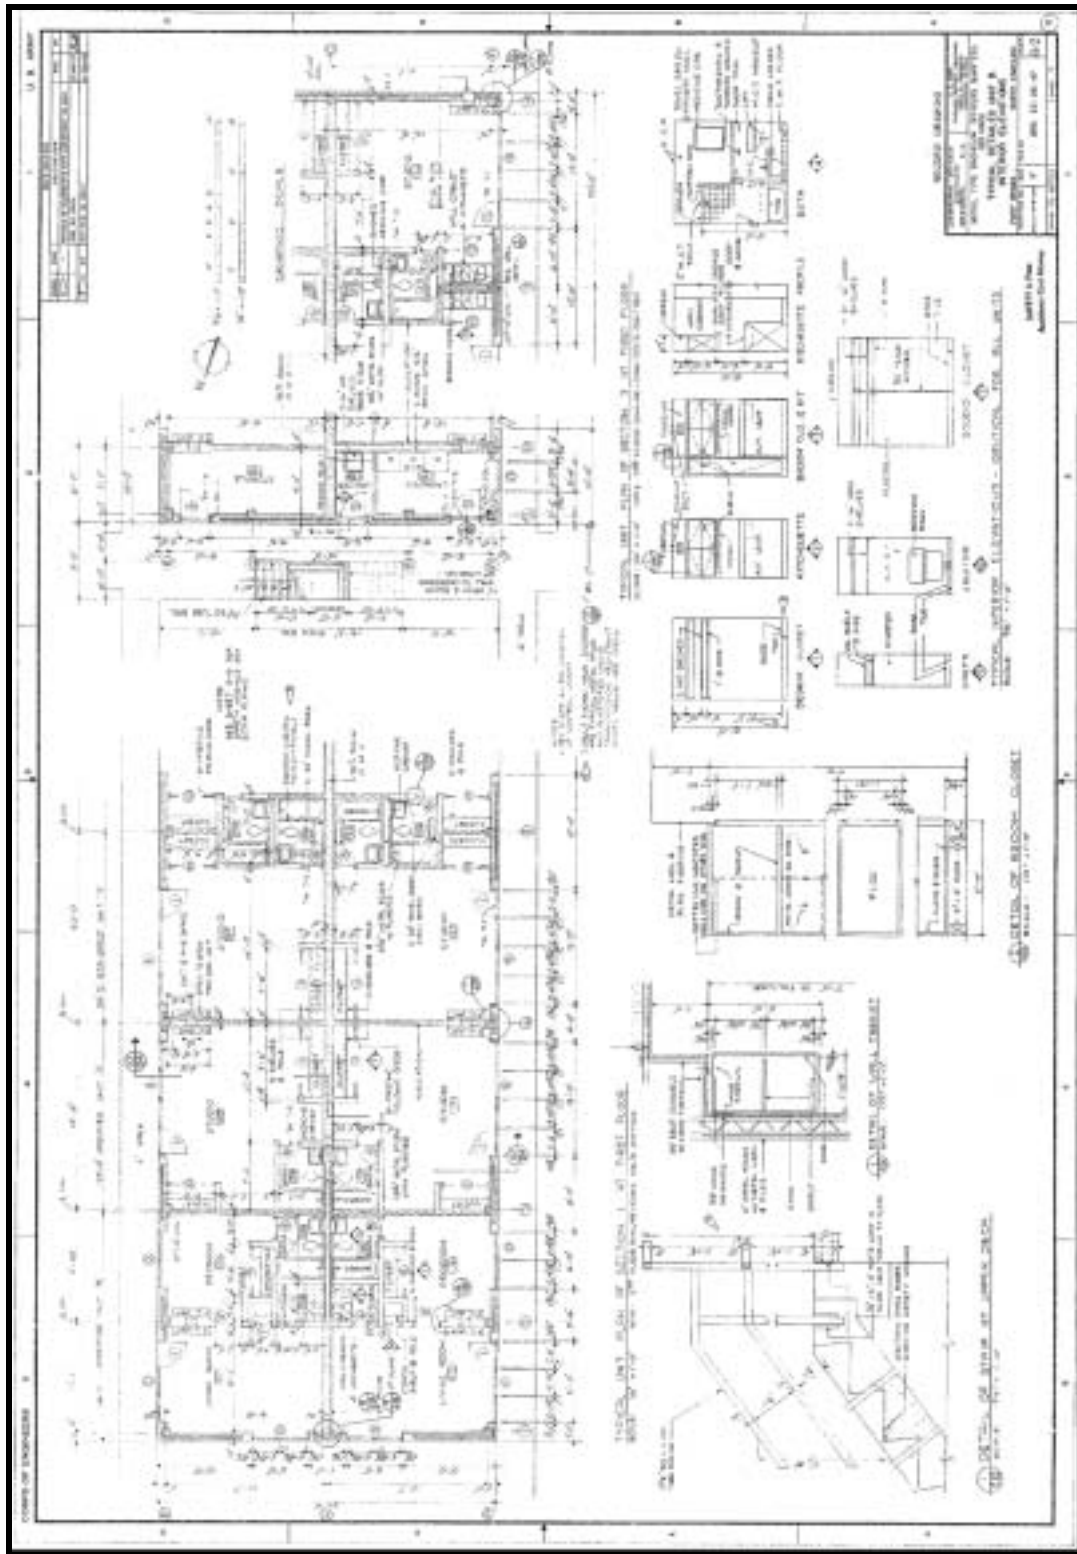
120-man motel type BOQ, typical unit and interior elevations, Ft. Bragg (1967, revised 1969) (Engineering, Ft. Bragg).
